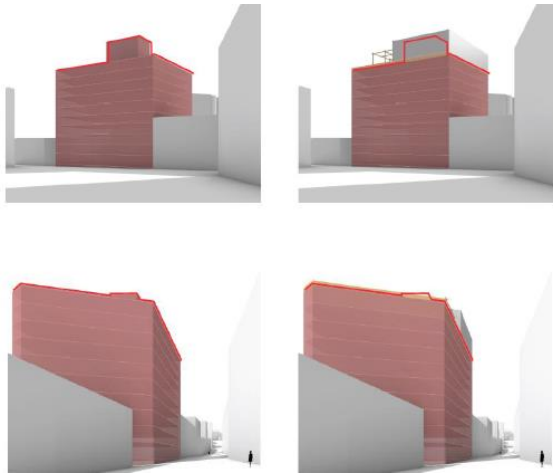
Massing plans comparing the existing condition of the site (left) and proposed works (right), as viewed from the opposite side of Kippax Street looking north-west (New Limited car park) and from Elizabeth Street, looking east.
